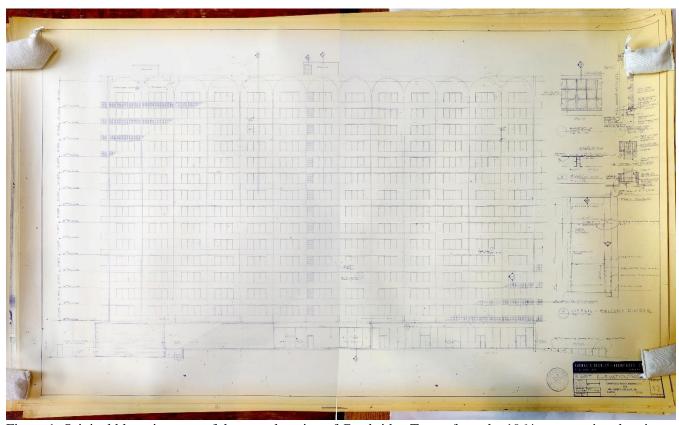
Original blueprint copy of the east elevation of Cambridge Tower from the 1964 construction drawing set. Source: Austin History Center, Architecture Collection.
